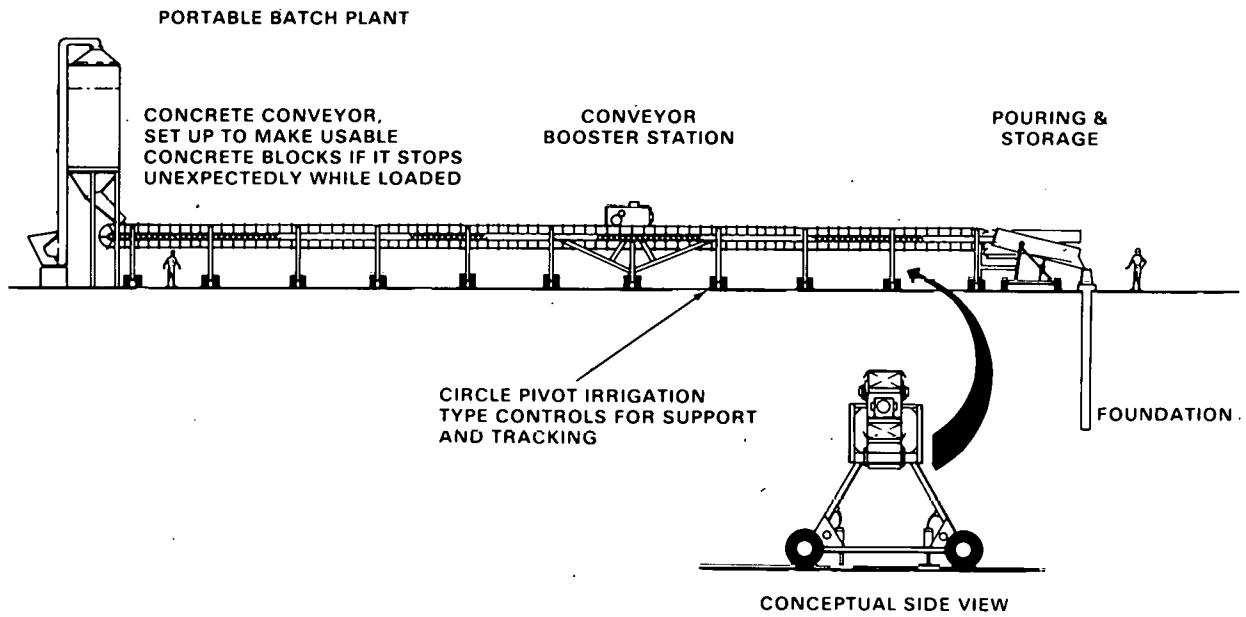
CONCRETE CONVEYOR HELIOSTAT FOUNDATIONS
